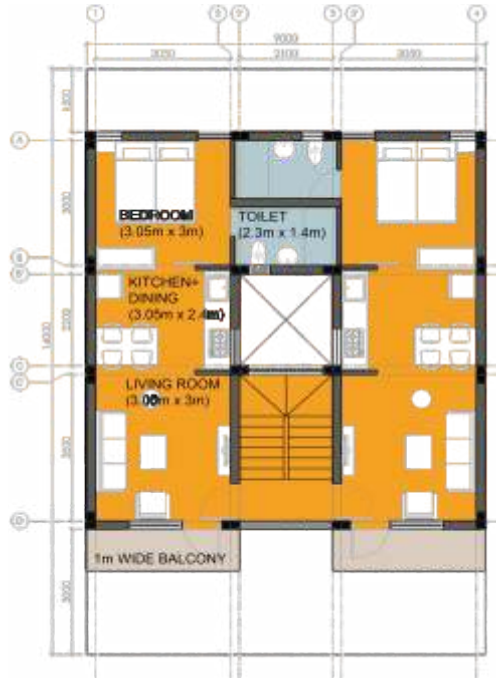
Typical ground floor plan of Type 5 dwelling unit
